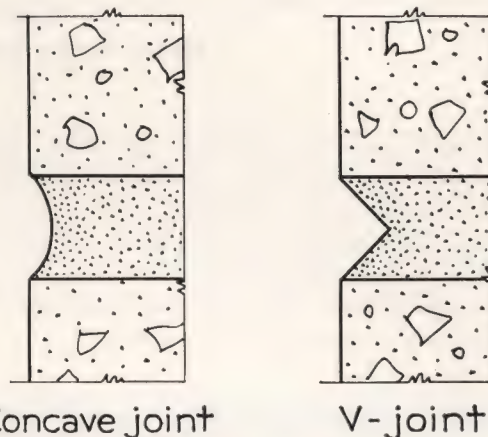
Tooled mortar joints recommended for weathertight concrete masonry.
